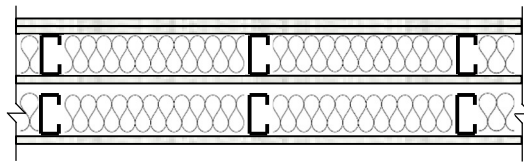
Example of a double steel stud wall with a layer of gypsum board installed inside the cavity between the rows of studs.
